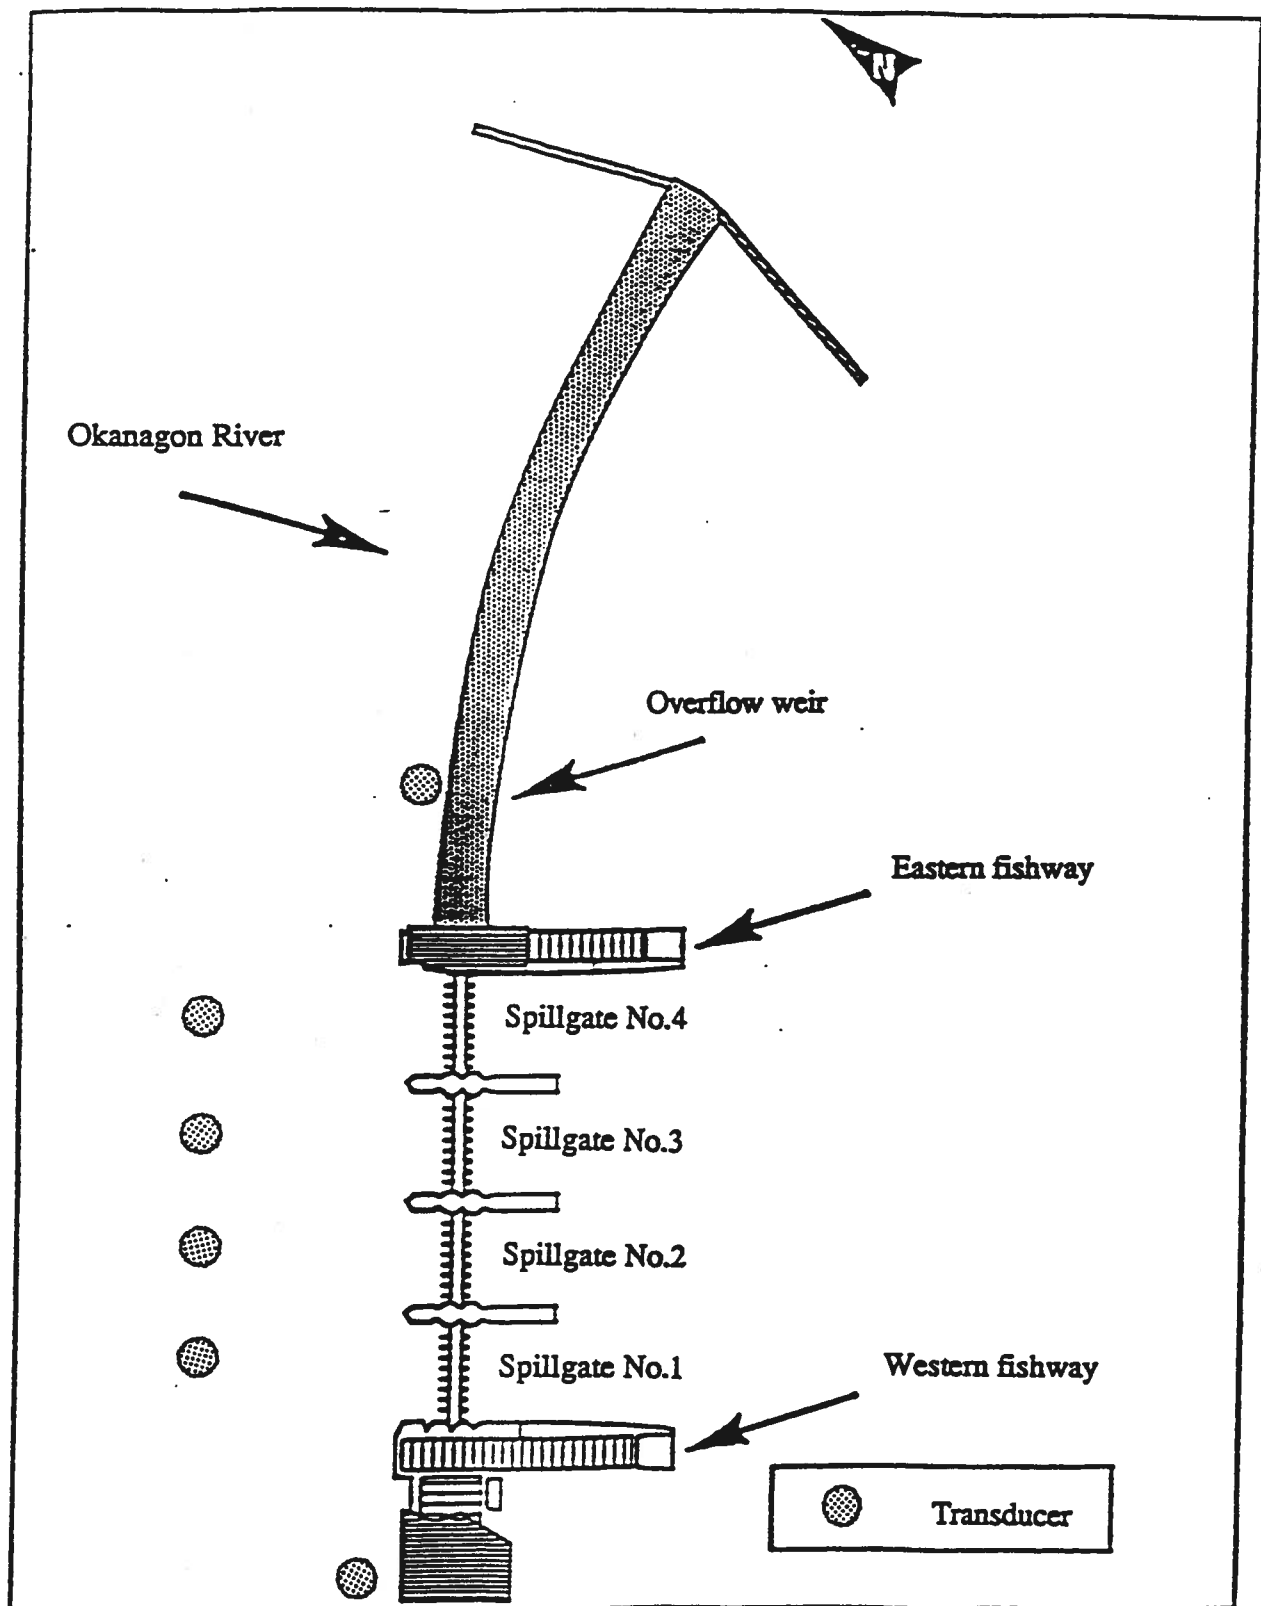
Plan view showing locations of transducers at Zosel Dam in 1991.
